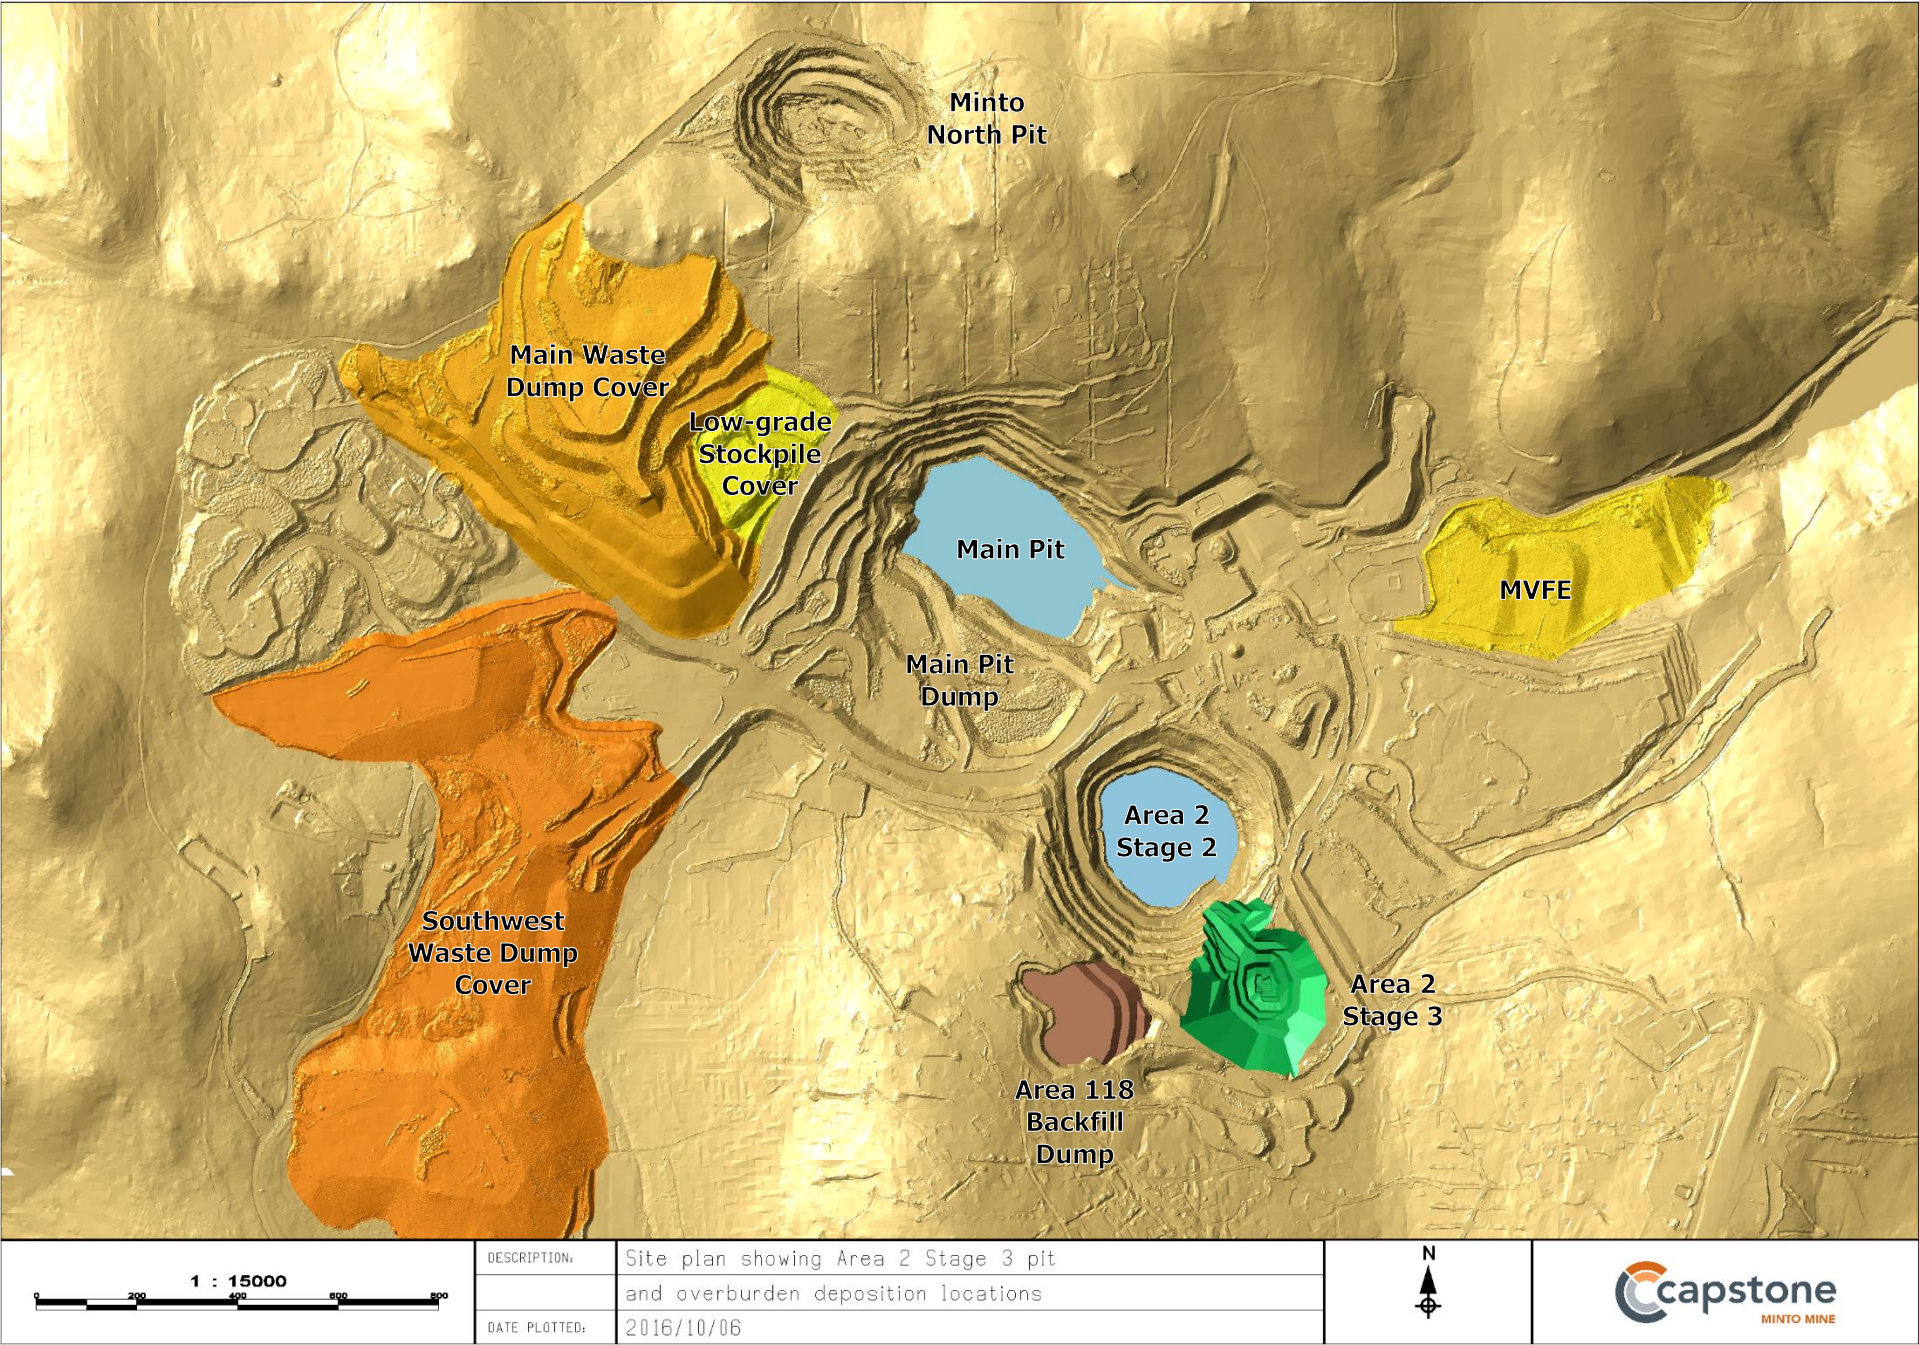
Overview of Area 2 Stage 3 pit and its overburden dump locations.
